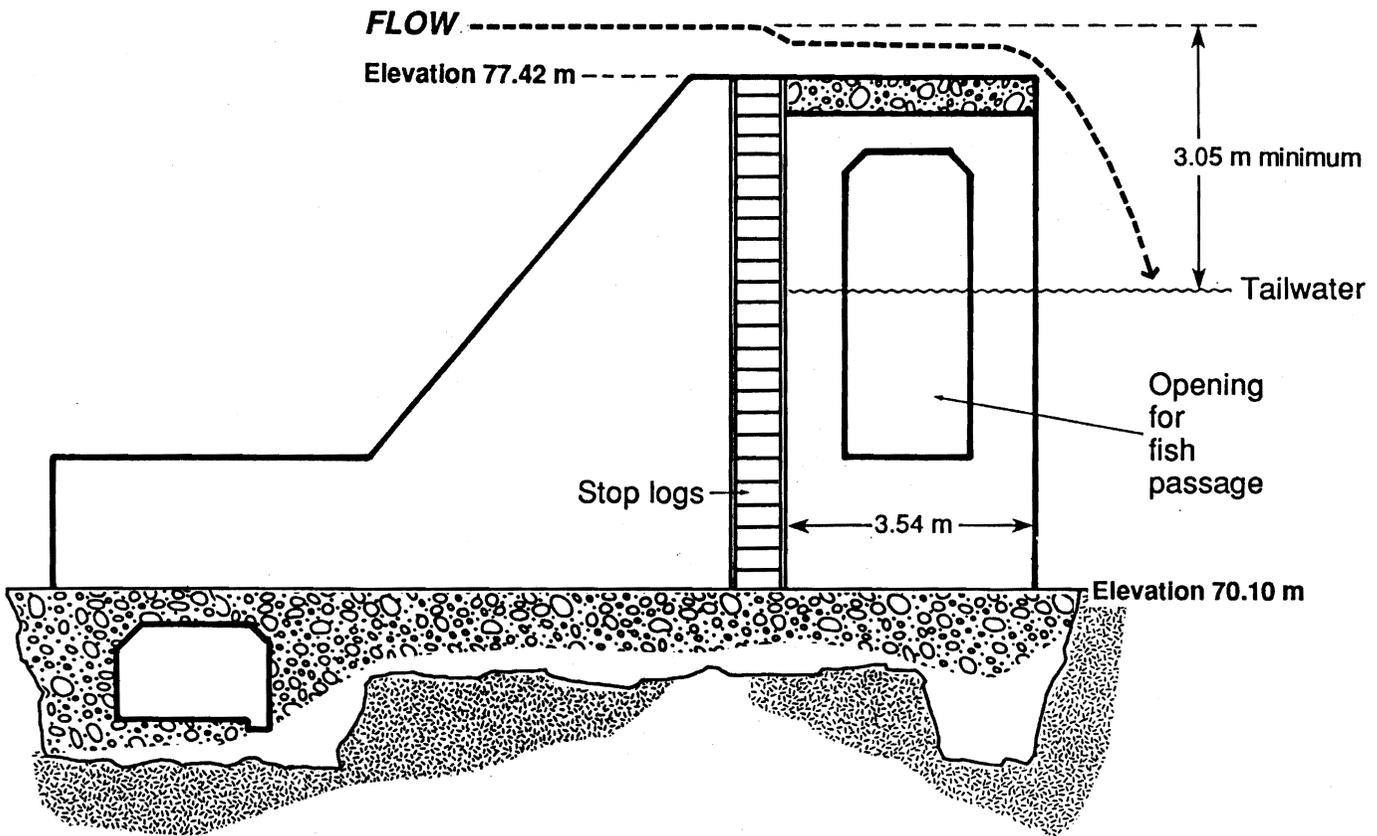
Cross section of drop-barrier dam used to collect Pacific salmon at Mayfield Dam on the Cowlitz River, Washington.
